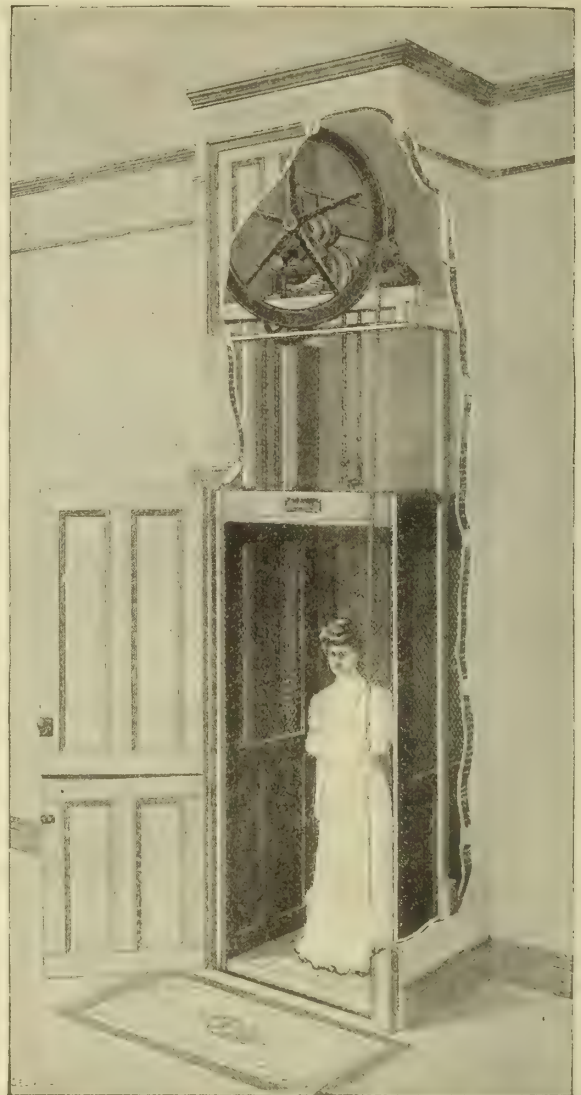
FIG. E. "SEDGWICK" AUTOMATIC BRAKE HAND-POWER INVALID ELEVATOR
